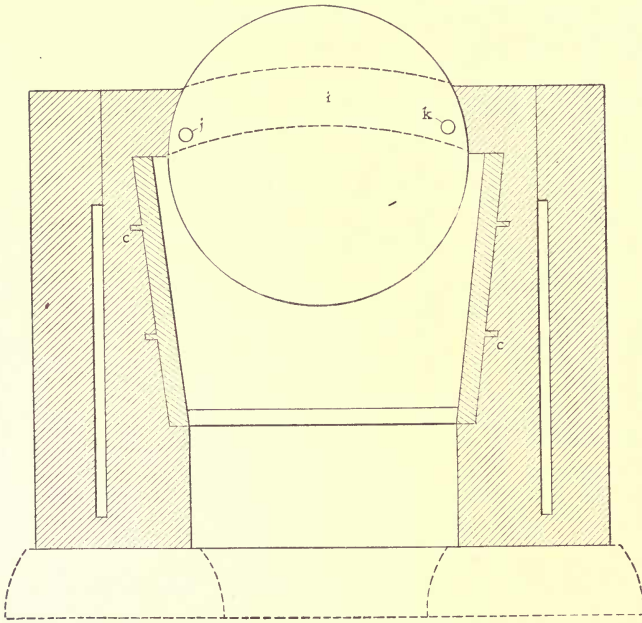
SECTIONAL END VIEW OF HORIZONTAL BOILER SETTING.
